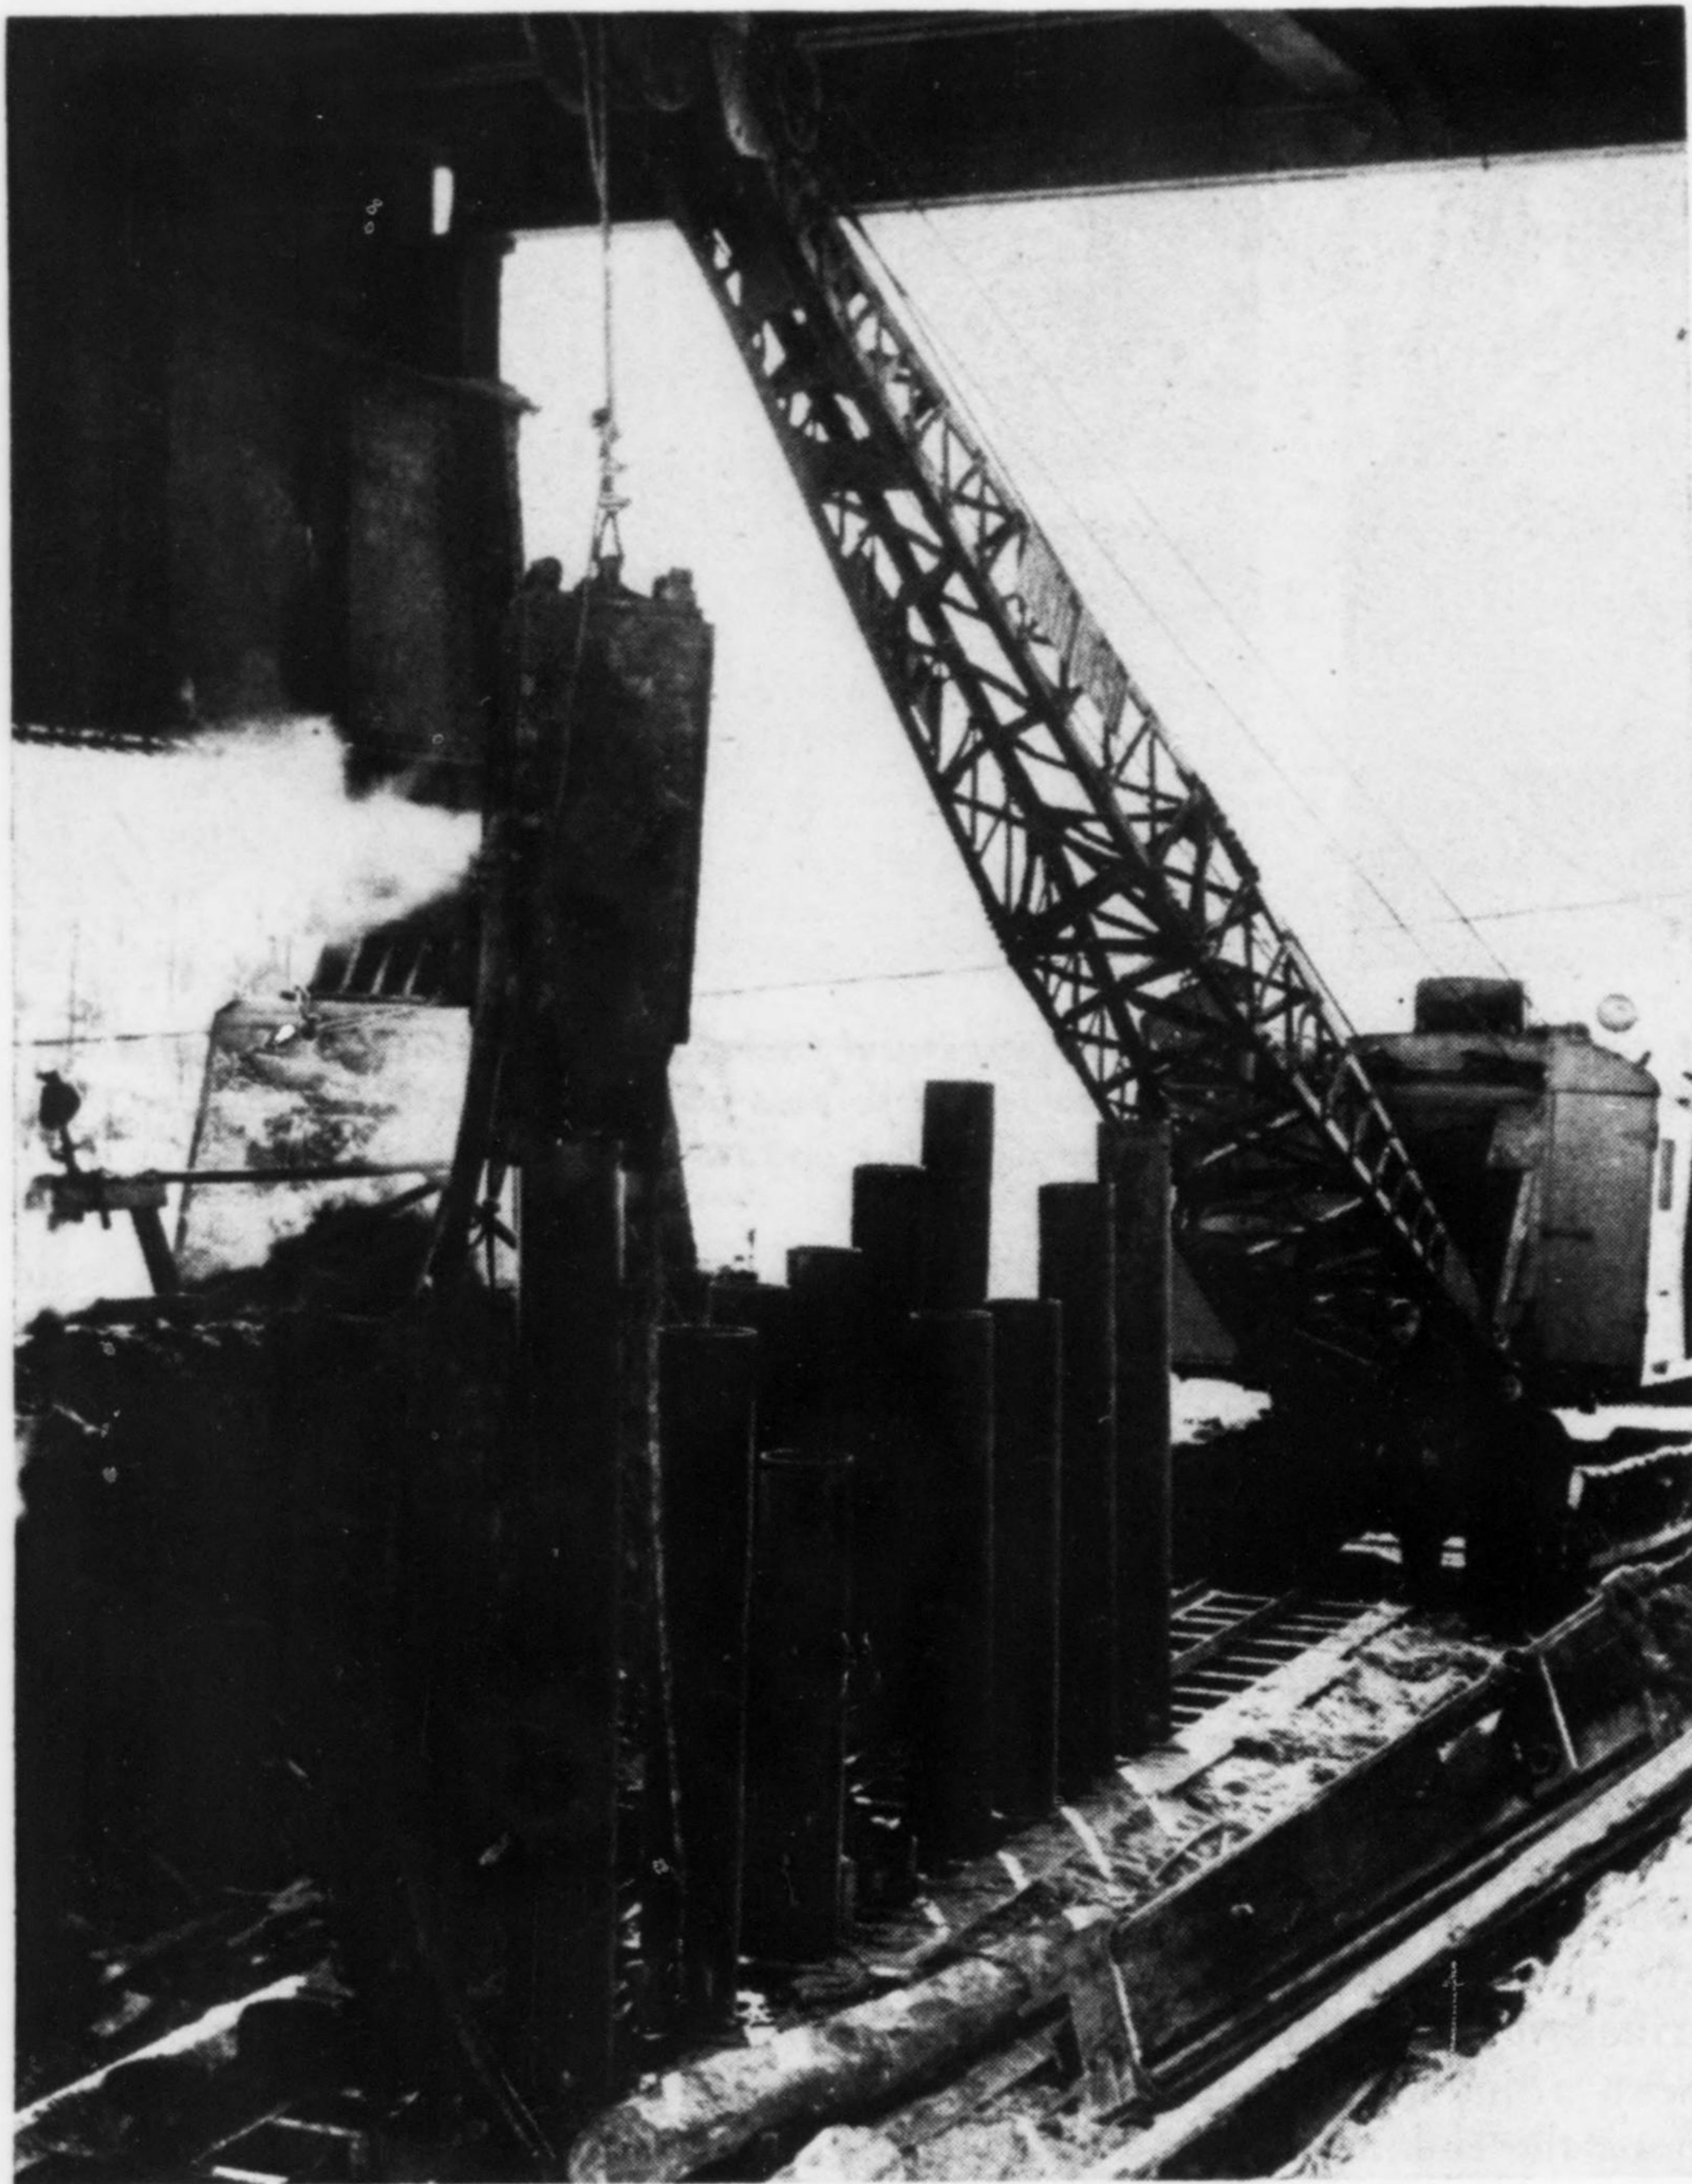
Piers 1 and 4 rest on pipe piles filled with concrete and, from near the ground line, are encased in concrete.
